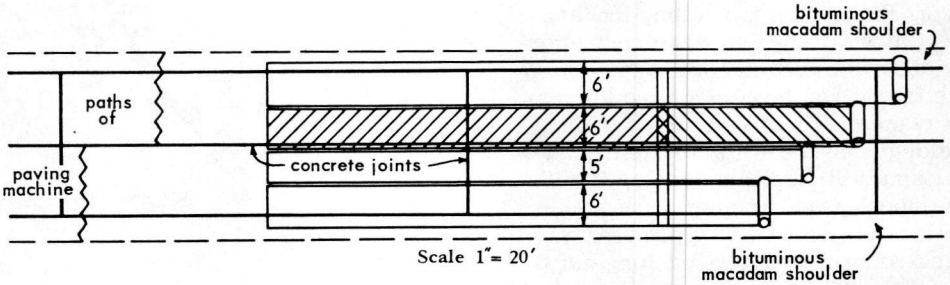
Placement of fabric on road. Continuous reinforcing with roll fabric.
